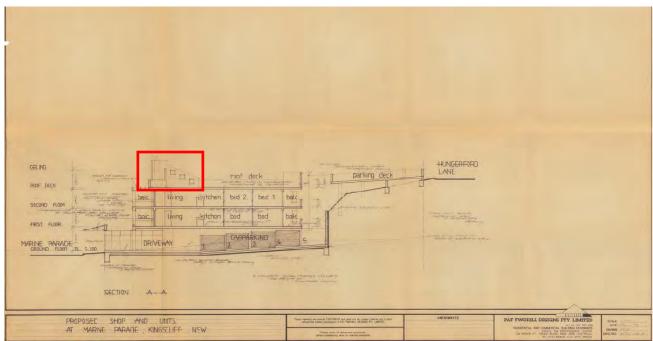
Extract of stamped approved section plan for building at 28 Marine Parade, Kingscliff (red box highlights extent of variation to fourth storey component)
